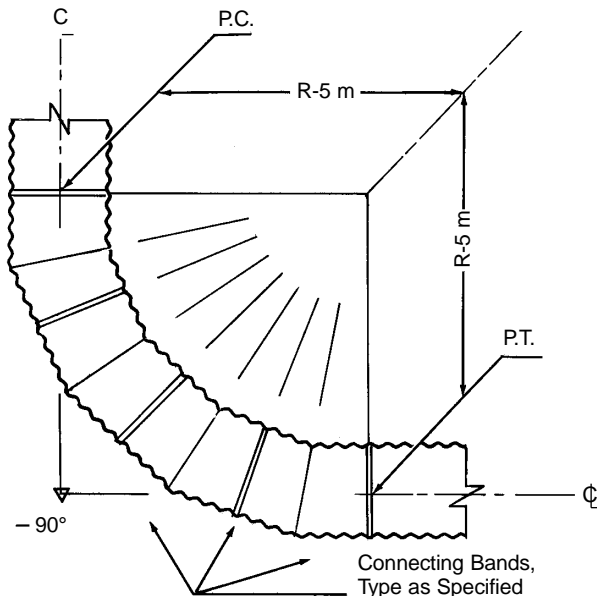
Alignment for Pipe Elbow Sections. The above is a design to negotiate a 90° alignment change through the use of four 22 1/2° sections.
